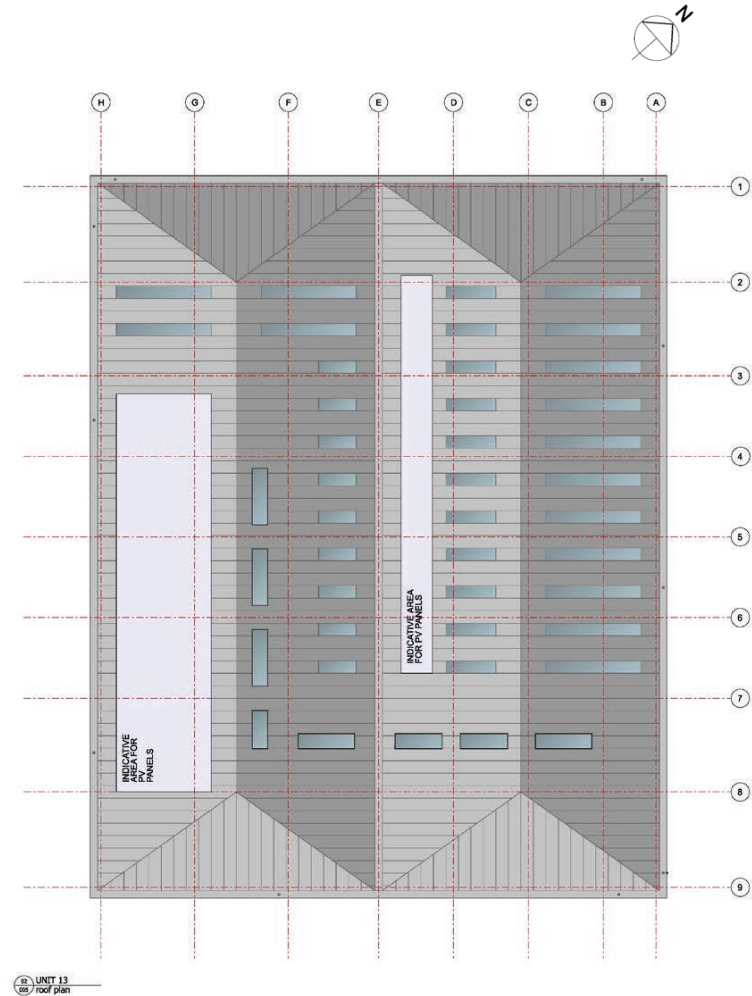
UNIT 13 ROOF PLAN SHOWING ROOF LIGHTS TO THE ANCILLARY SPACE AND WAREHOUSE PLUS INDICATIVE PV AREA ALLOCATION - NOT TO SCALE
